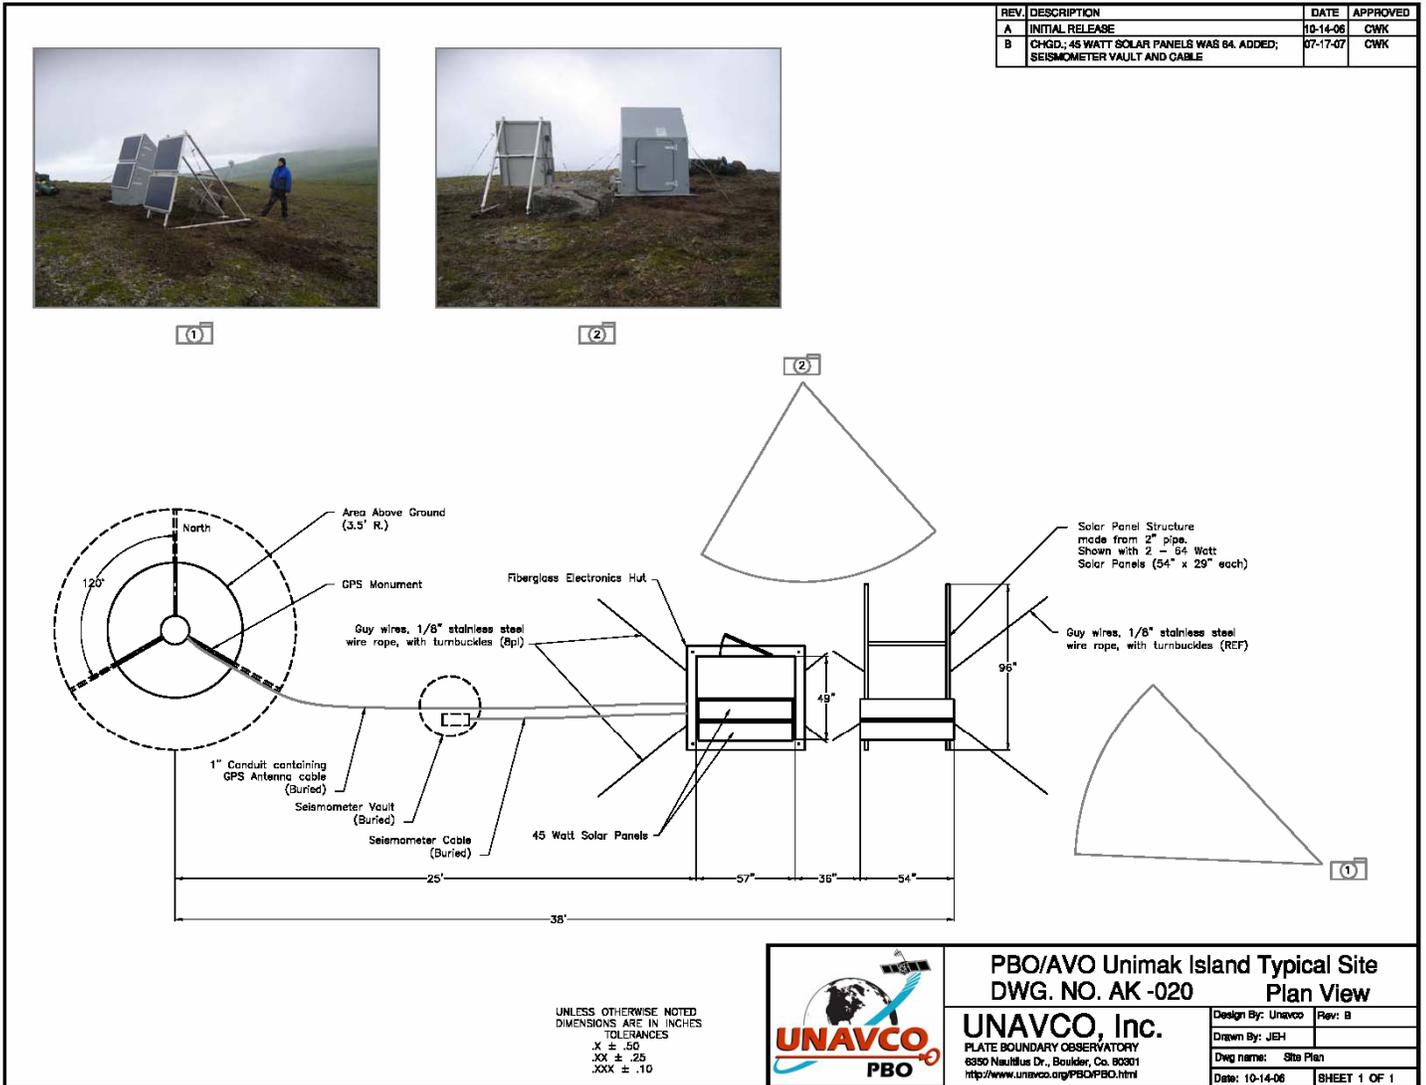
Typical plan view of a short drill-braced monument, equipment enclosure, solar panel support structure, and seismometer
